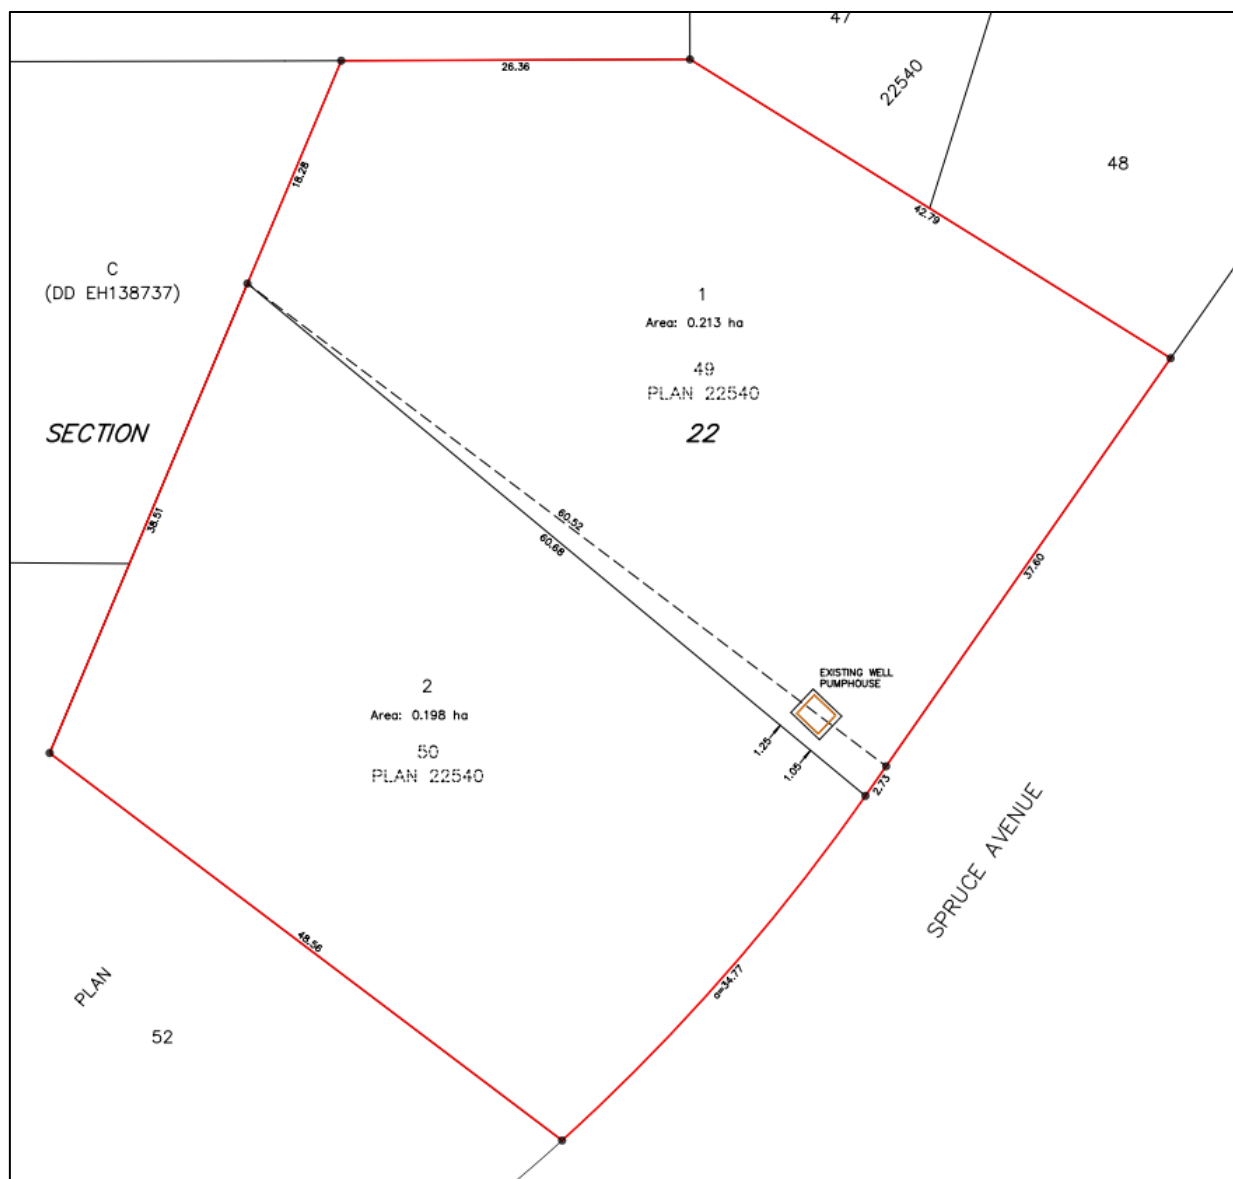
Proposed plan of subdivision showing the existing lot line intersecting with the well pumphouse.
